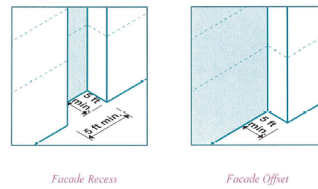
Facade Articulation Example for a Building with Perpendicular Roofs
